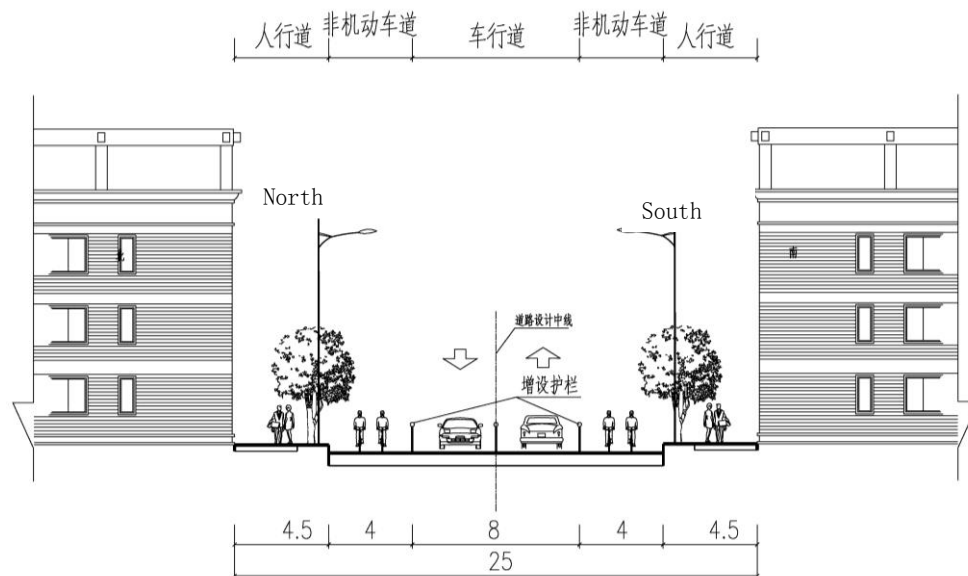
Sectional View for Reconstruction of Biyun Road (Handan Road ~ Wenchang Road)
